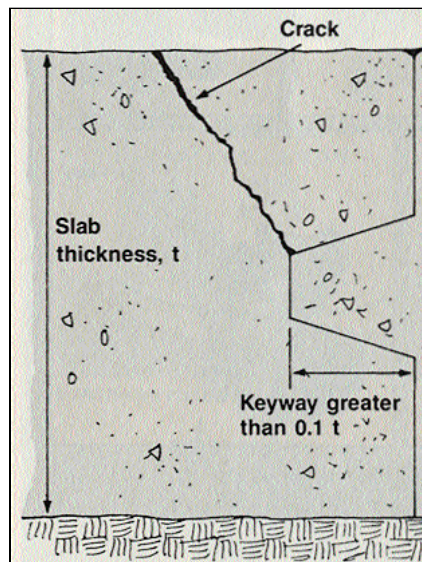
A keyway that's too large may cause slab cracking above the female side of the keyway.
